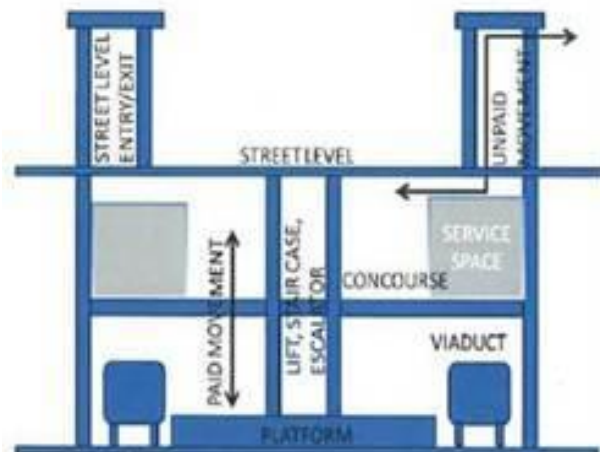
CROSS-SECTION OF A TYPICAL UNDERGROUND STATION
